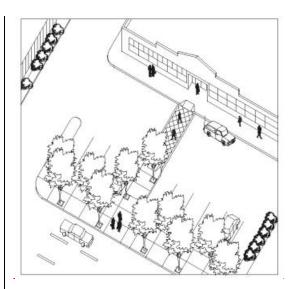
Figure Exception to 20.50.240(A)(2): Example of design elements to connect the building frontage to a street across a parking area.
